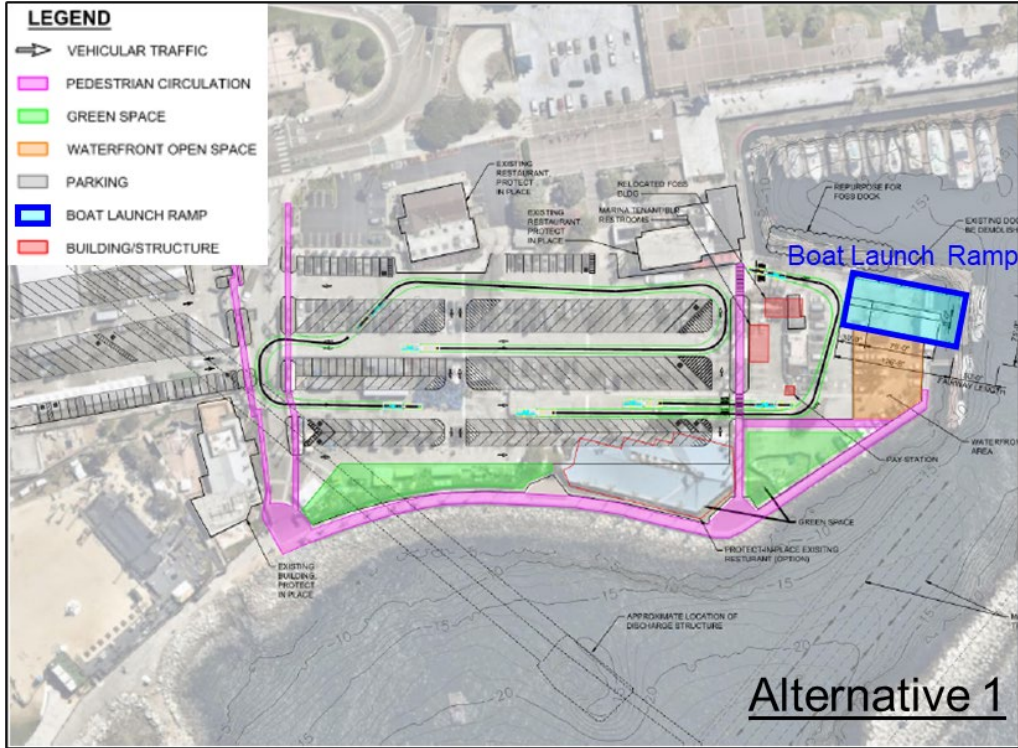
Boat Launch Ramp Placement – Alternative 1 (dated December 18, 2024).
